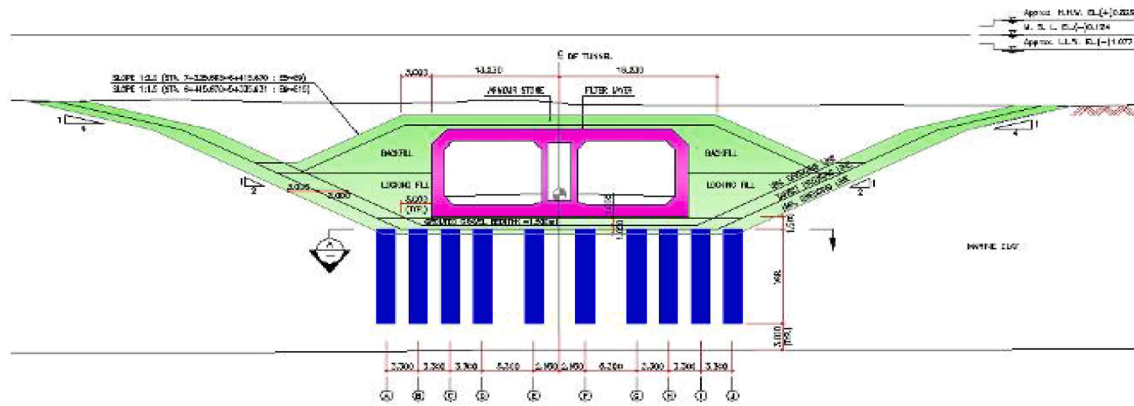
Typical Layout of tunnel trench with Cement Deep Mixing Foundation.
